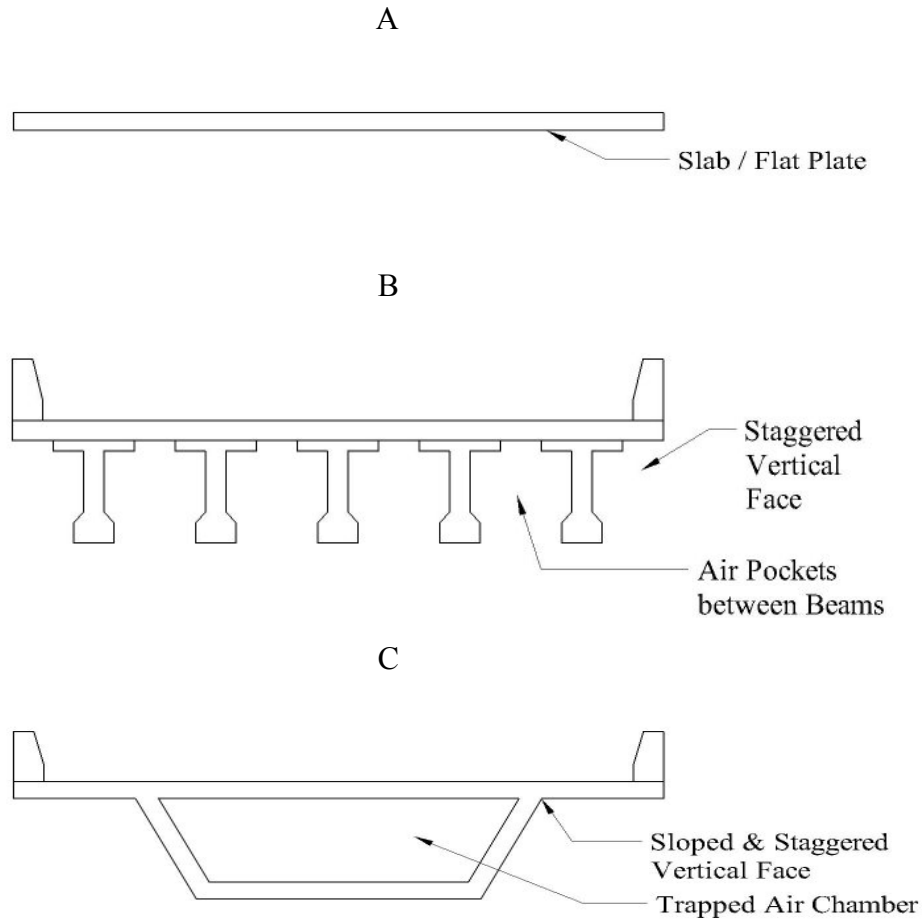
15 Common bridge superstructure types in Florida. A) slab, B) slab and girder, C) segmental box girder.
